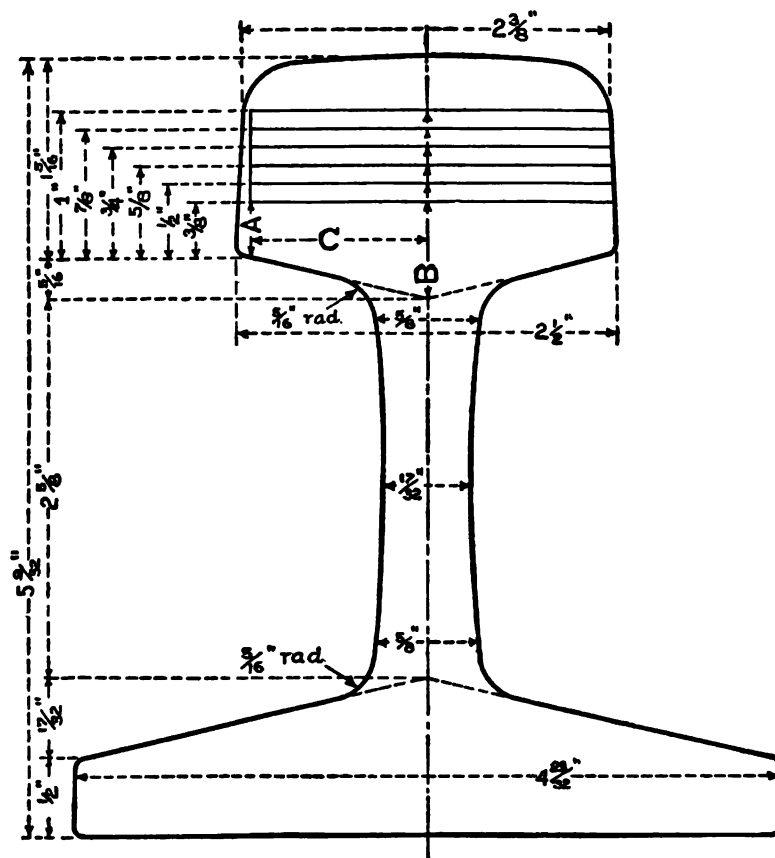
Diagram of Pieces tested for Sag of Rail Head and Bending of Web.
